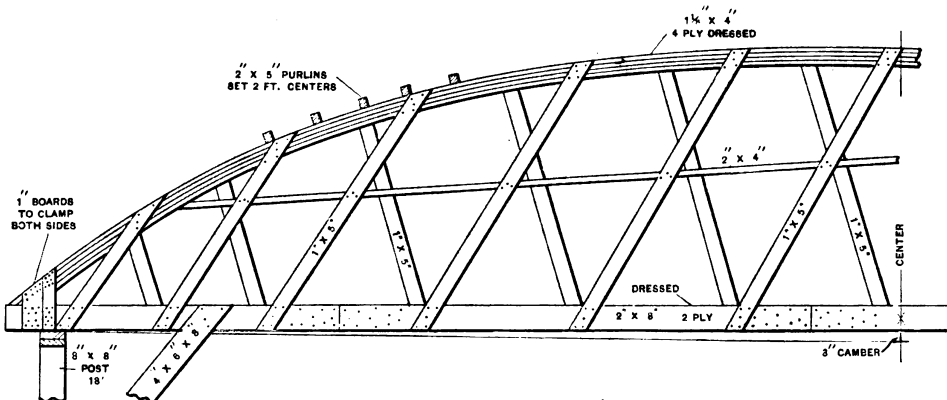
Half of Roof Truss, Showing Construction at Foot of Arch Beam.
